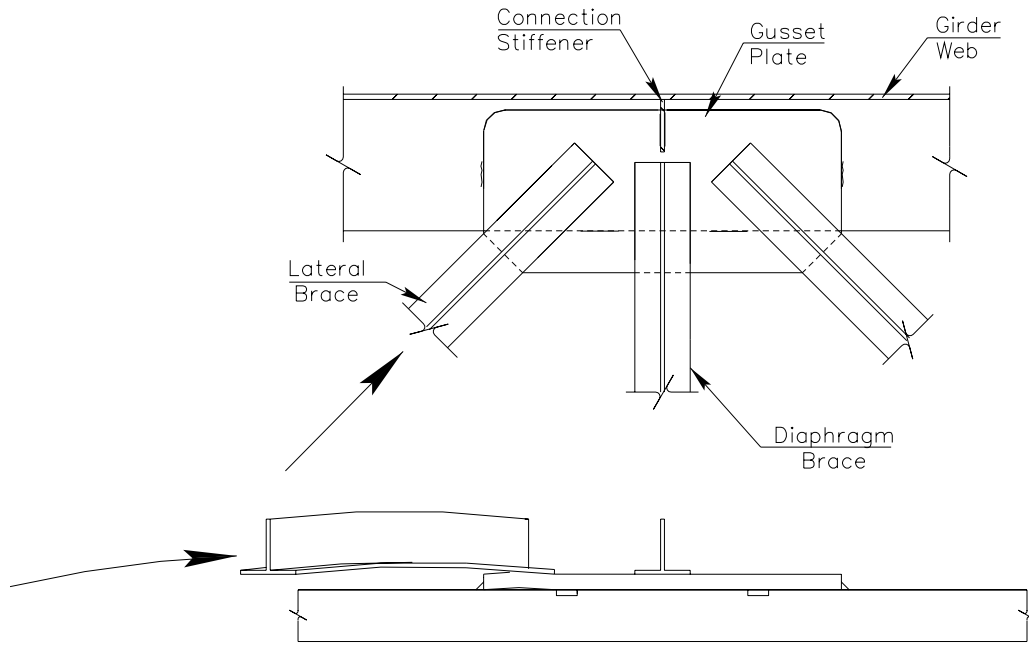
Gusset Plate Cracking Patterns (Picture)
